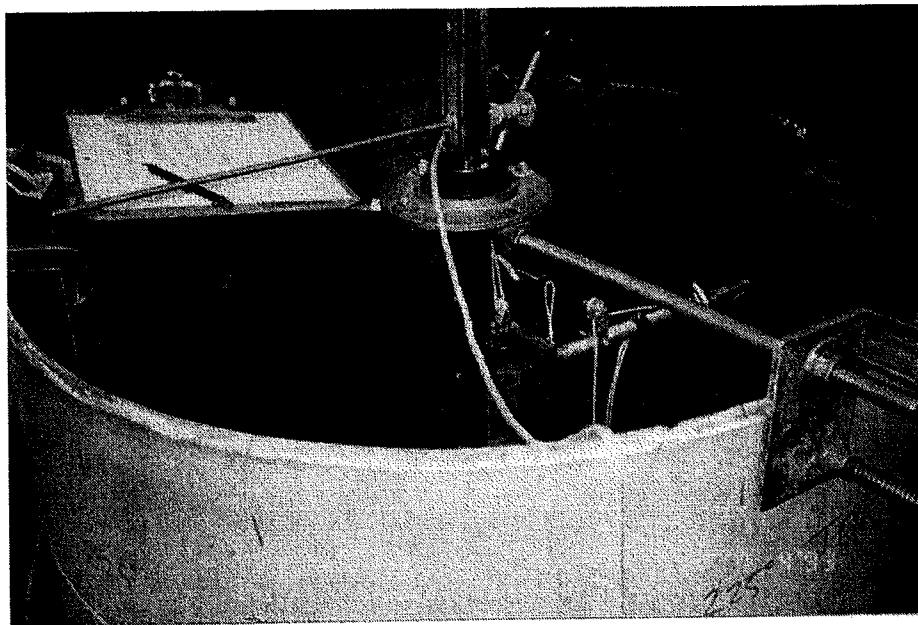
View of the Imperfection Device at the top of a Test Specimen
